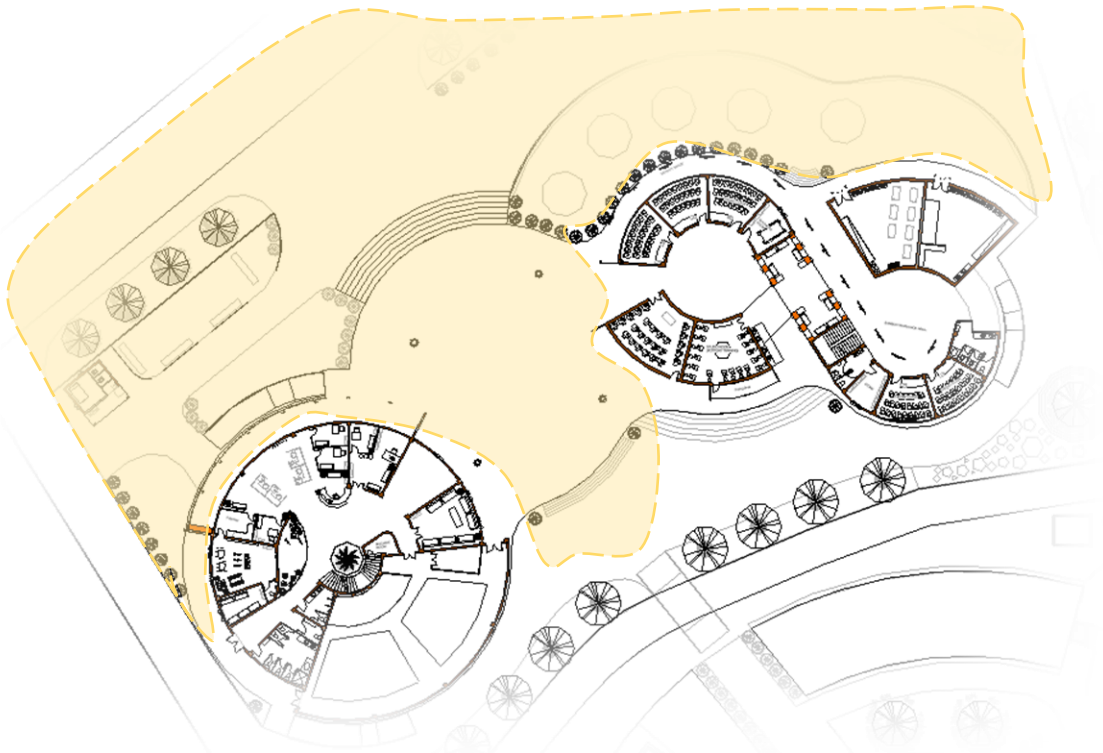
Extrovert Planning: Outward Planning of Building in public zone
